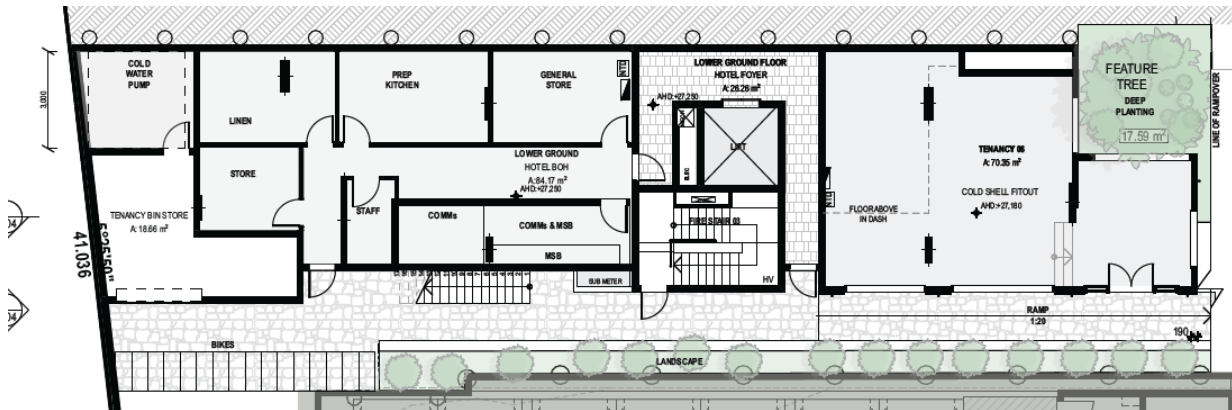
Excerpt of proposed basement 1 plan (Source: DAH. Architecture, 2025)
